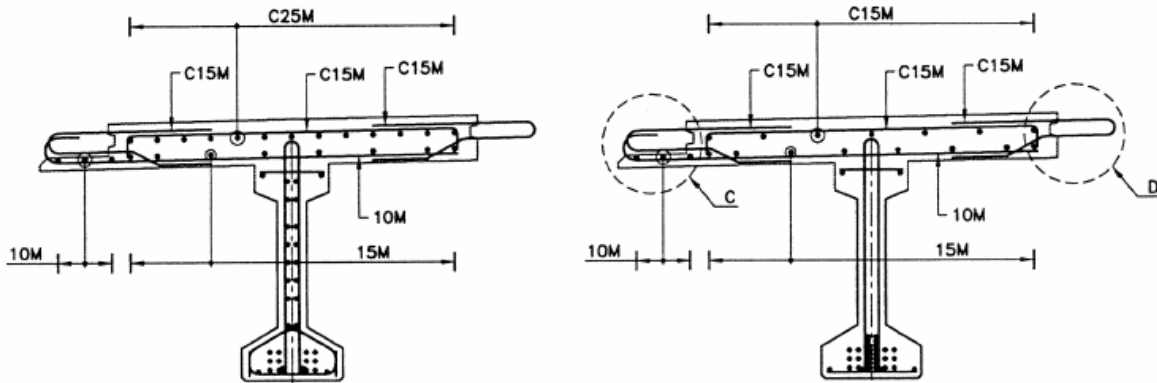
Typical T-Shaped Girder Unit with Reinforcing Details
